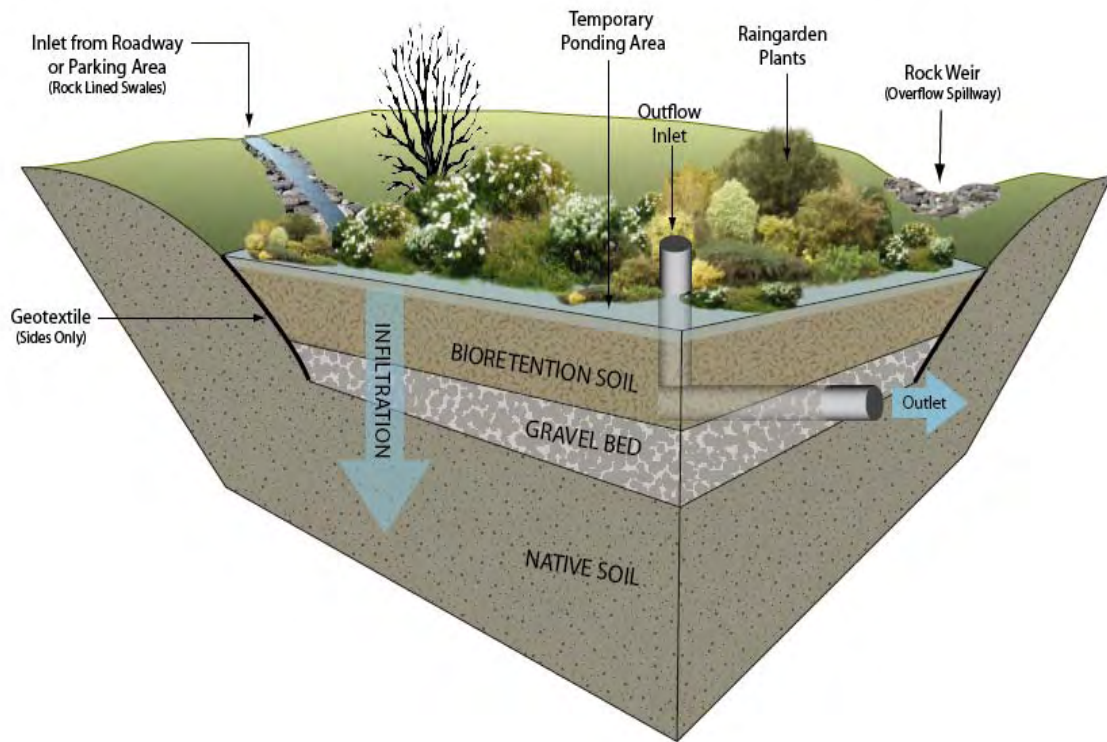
Cross-section of a typical bioretention cell with a riser pipe and outlet connection.
